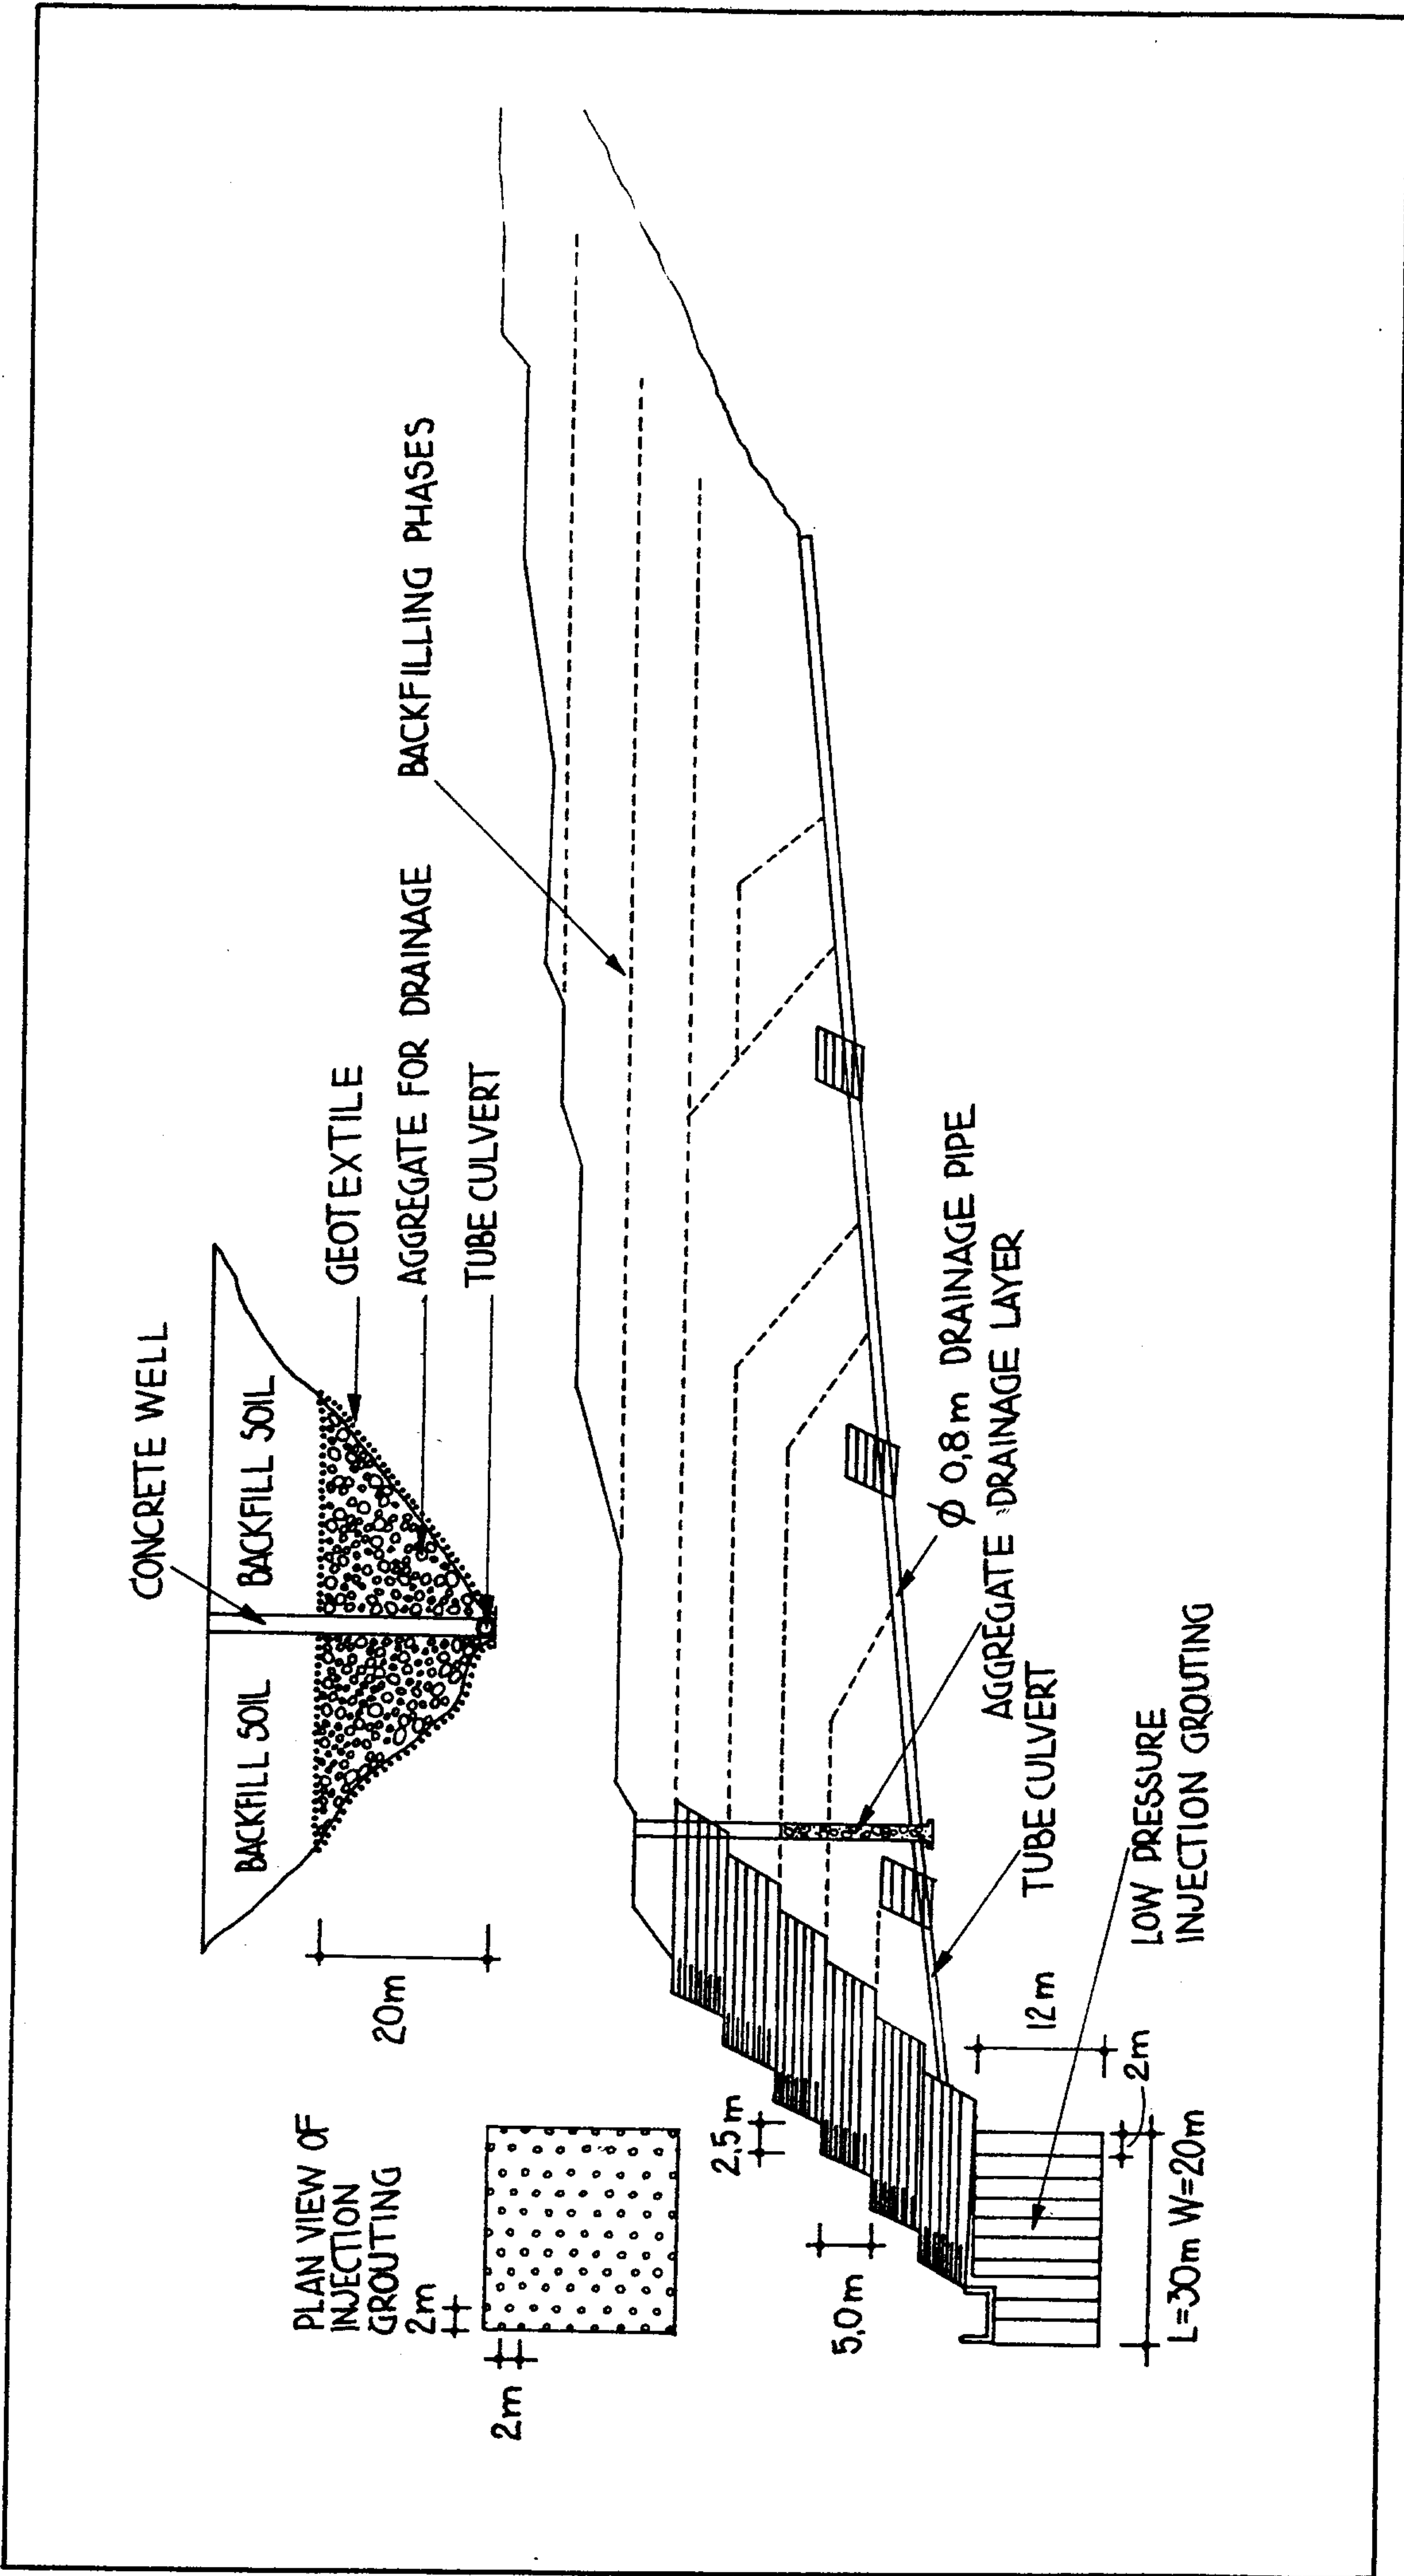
Cross section of the geogrid reinforced soil wall with details of the drainage system
